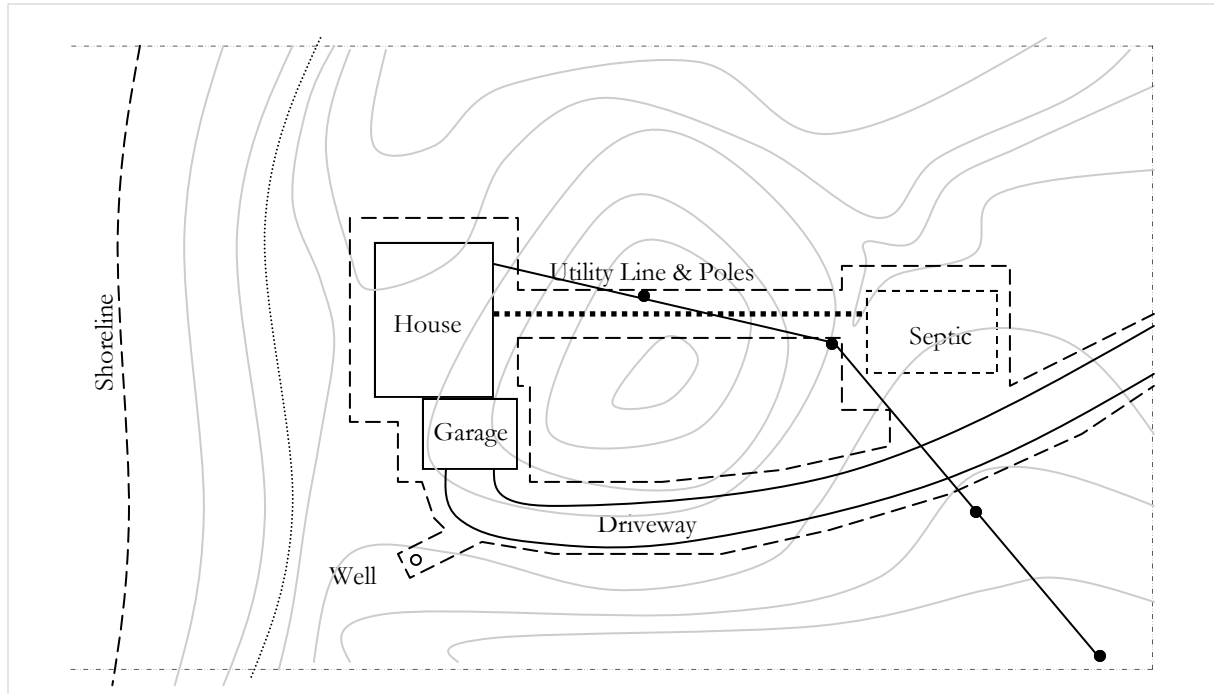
Site plan in dune slope areas with excavation impact area delineated.
